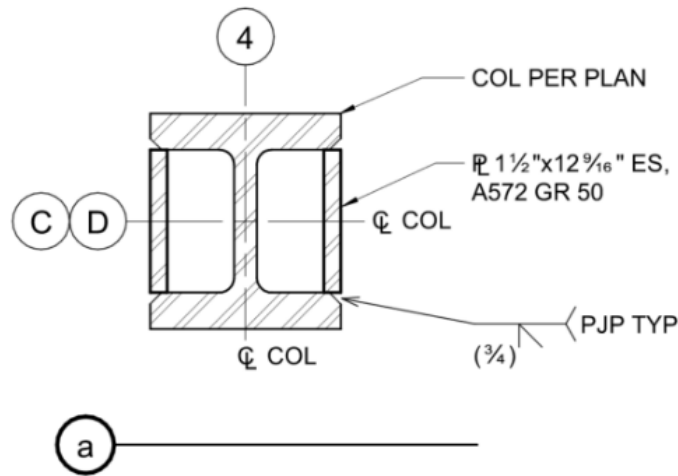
Reinforced W14x455 Columns Forming the Inelastic Braced Frames
